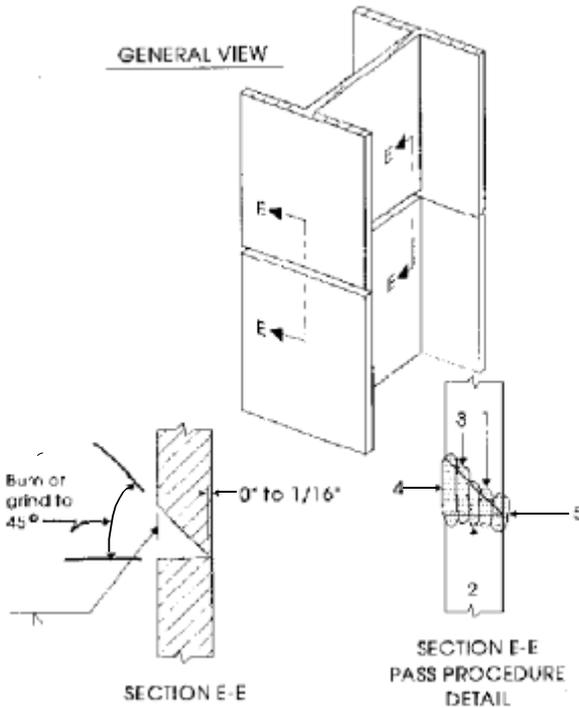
A - Joint Preparation for Groove-Welded H-Pile
